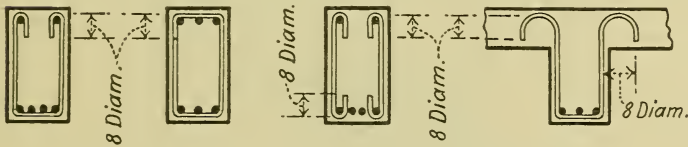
Typical Methods of Anchoring Vertical Stirrups.
